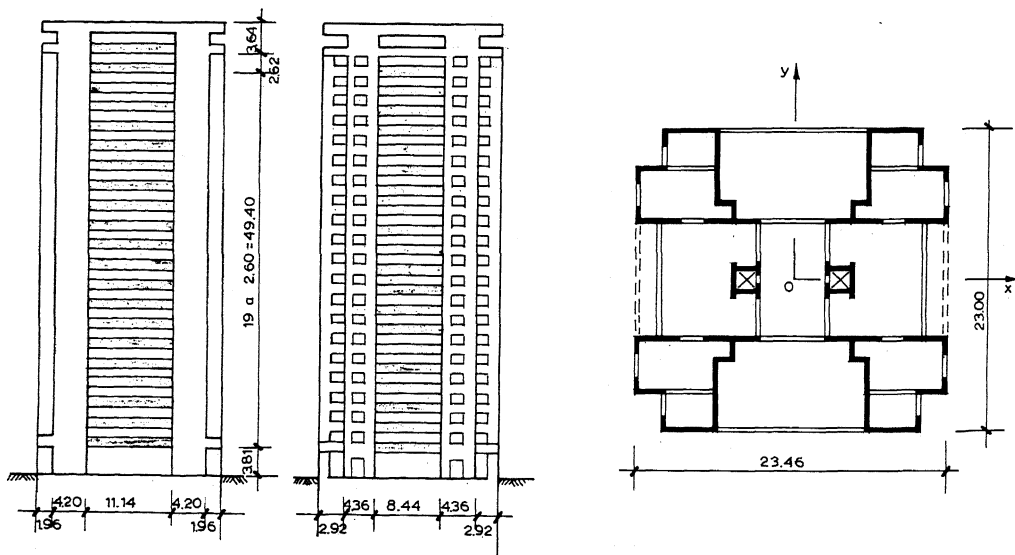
BUILDING N°3 PLAN AND ELEVATIONS
